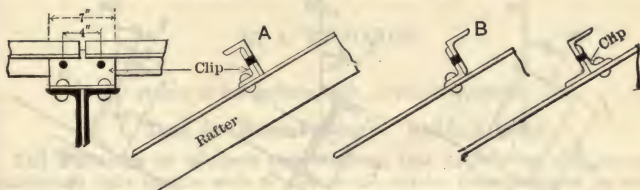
Purlin-connections. Steel Clips, Angles and Z Bars
